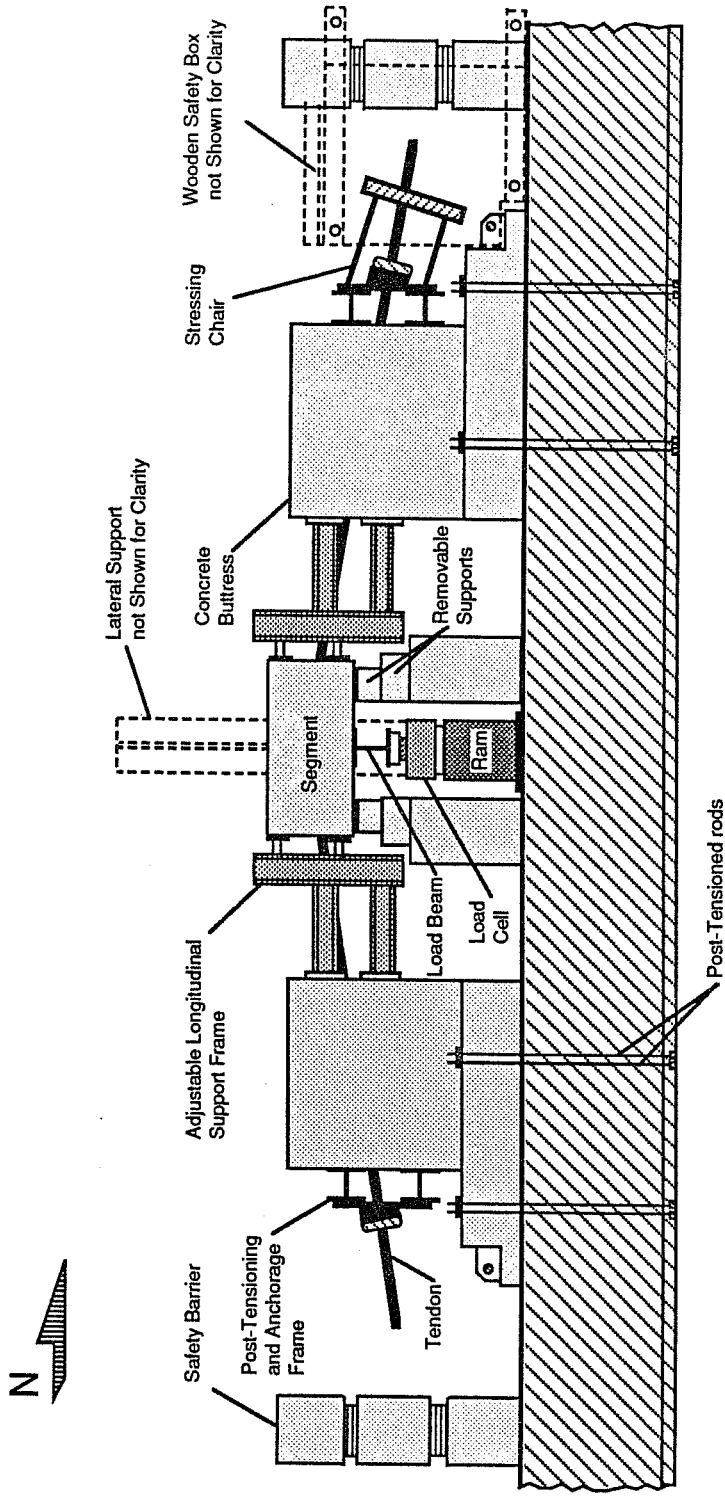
12 Elevation of Test Setup (after Hall 13)
